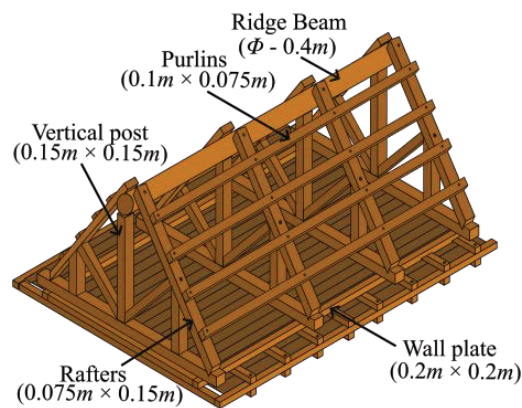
Typical sketch of the roof systems in Taq buildings
